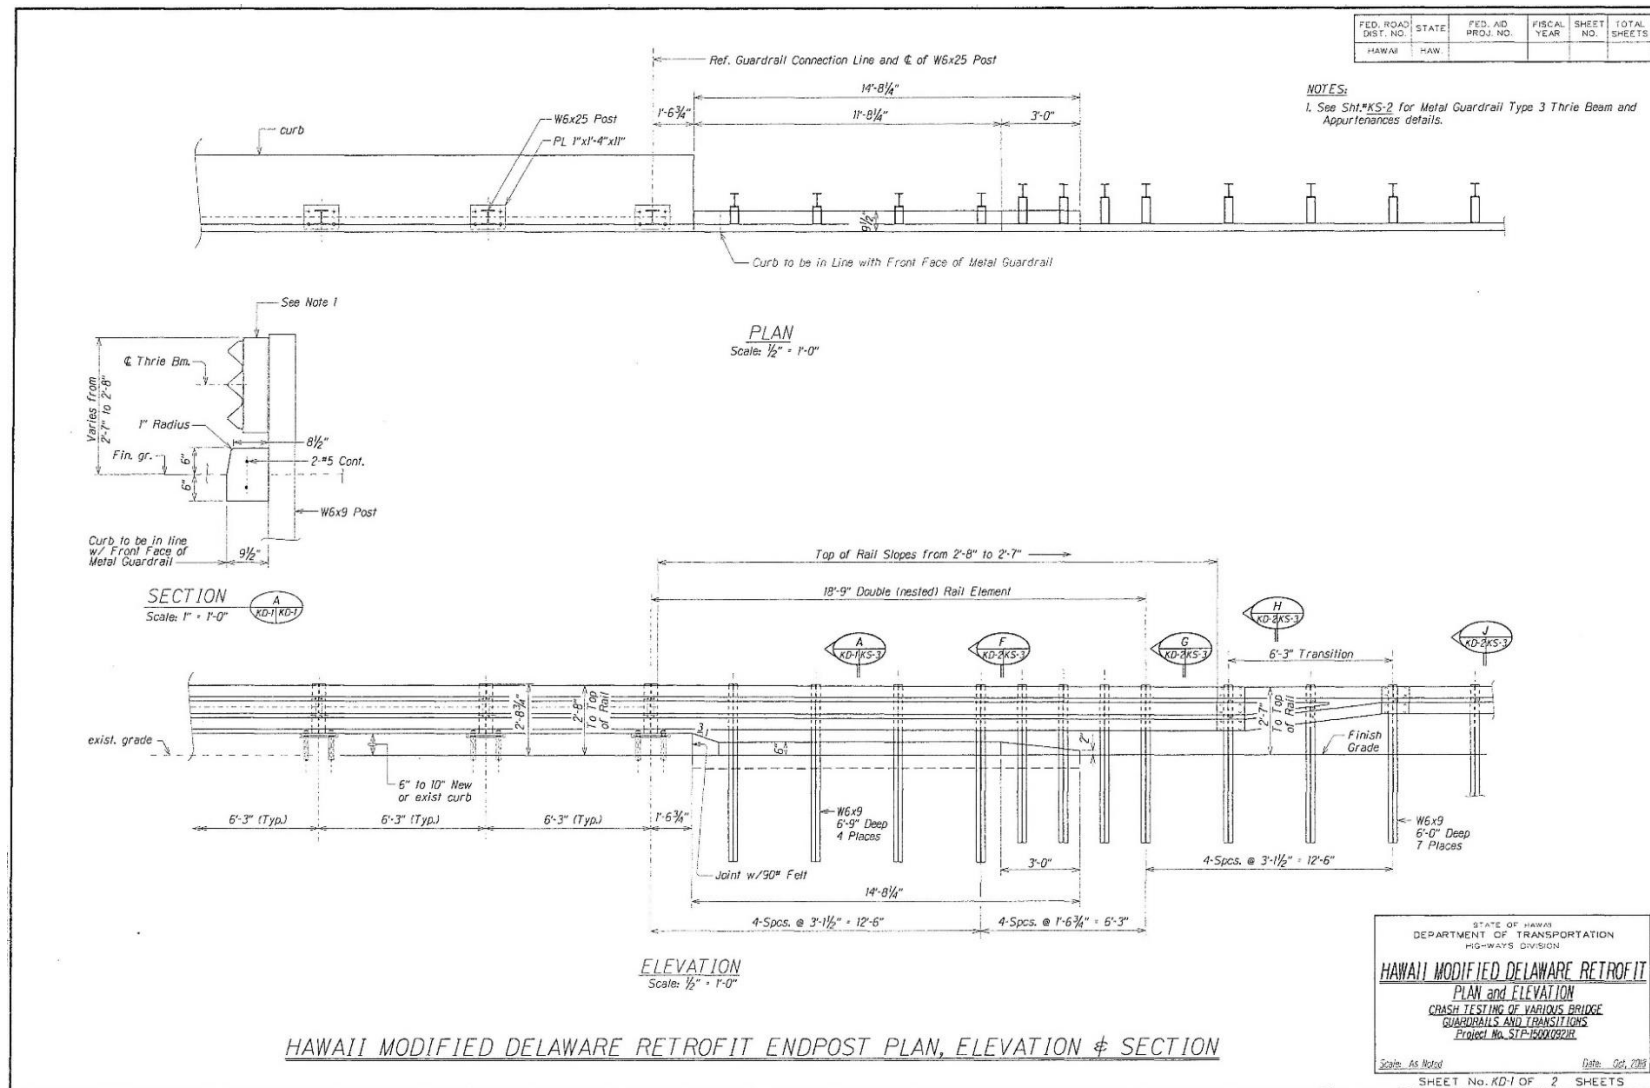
Original HDOT AGT Transition to Hawaii Modified Delaware Thrie-Beam Bridge Rail Details
